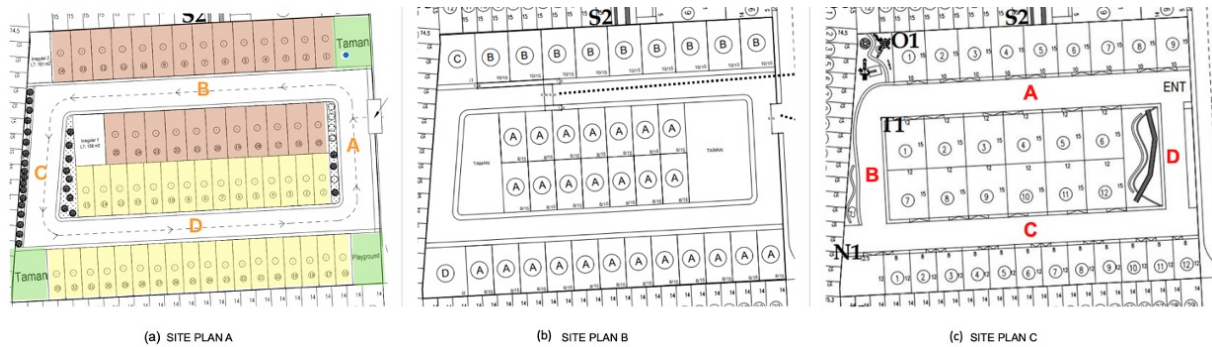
Research material, (a) Site Plan A, (b) Site Plan B, and (c) Site Plan C (source: author, 2022)
